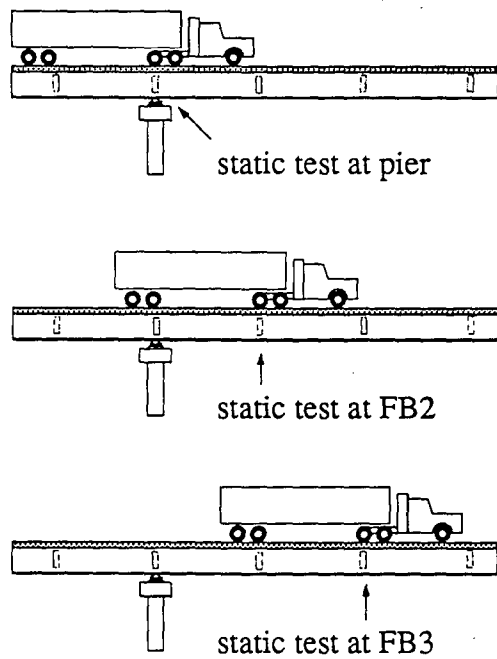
Lowboy Positions Over Floorbeams During Static Tests
